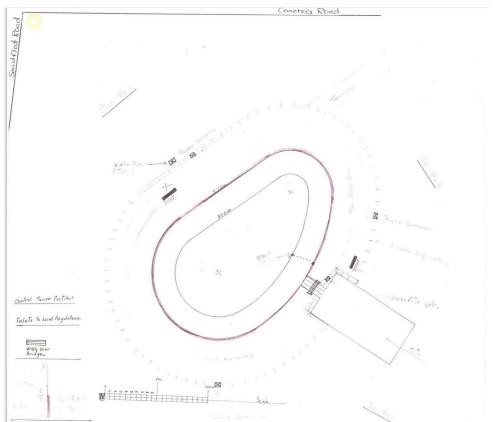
Original Approved Site Plan for the Speedway (Source: Application).
